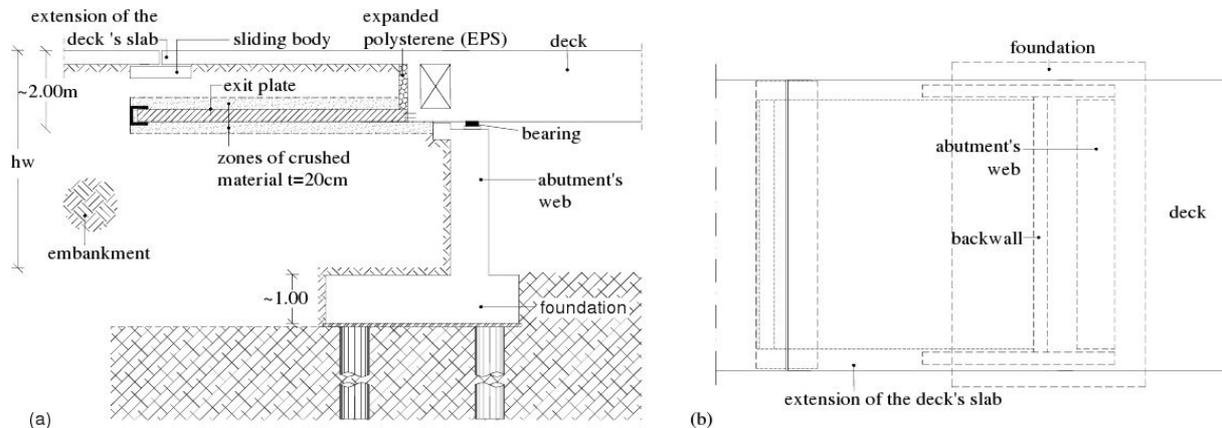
The proposed mechanism: (a) longitudinal section and, (b) plan view
